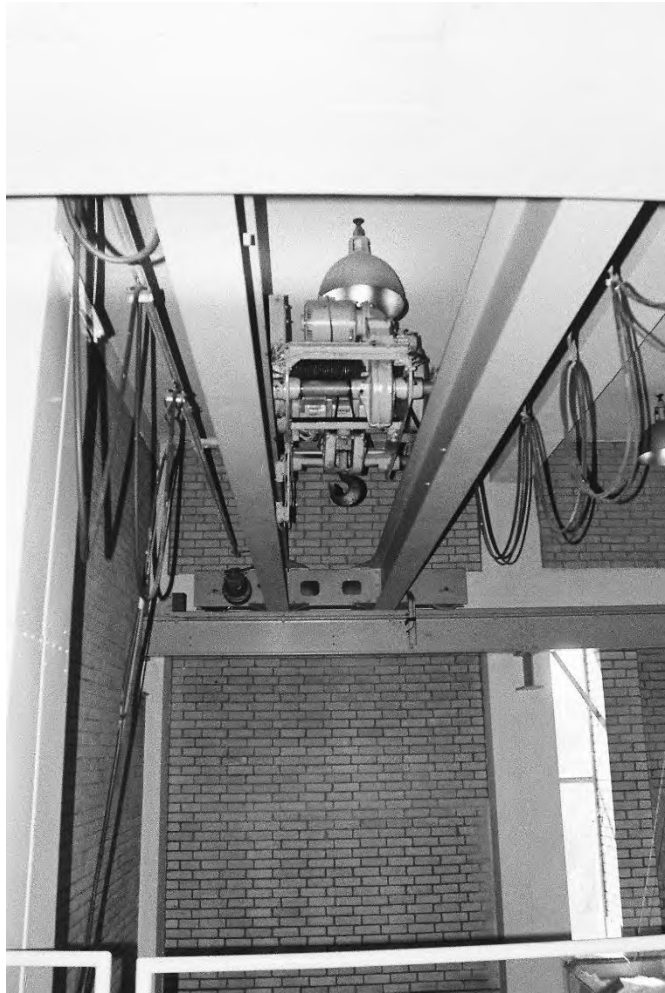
Block Q: Interior Second Floor Room Q11 (Swinden9_03). Facing West.
